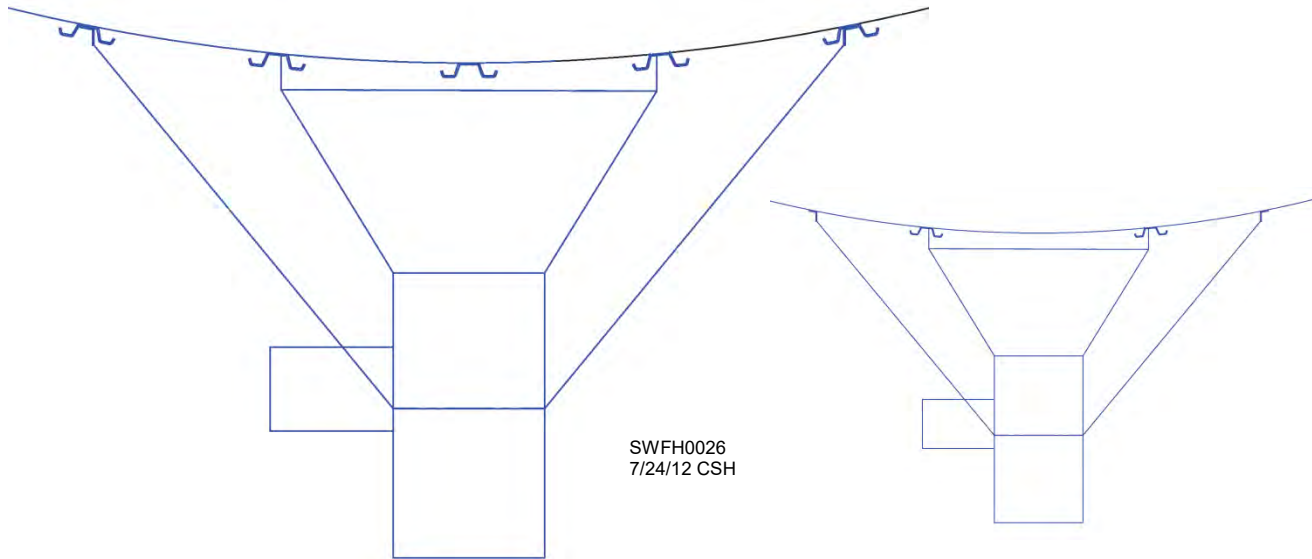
Attaching brackets to bin with four or two stiffeners per sidewall sheet
